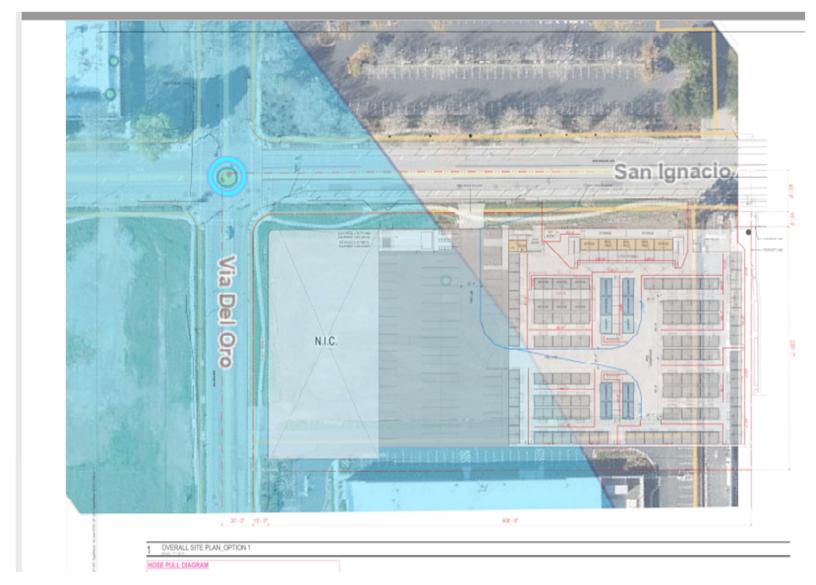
Archaeological Sensitivity Zone overlain on the Proposed Project Site Plan
